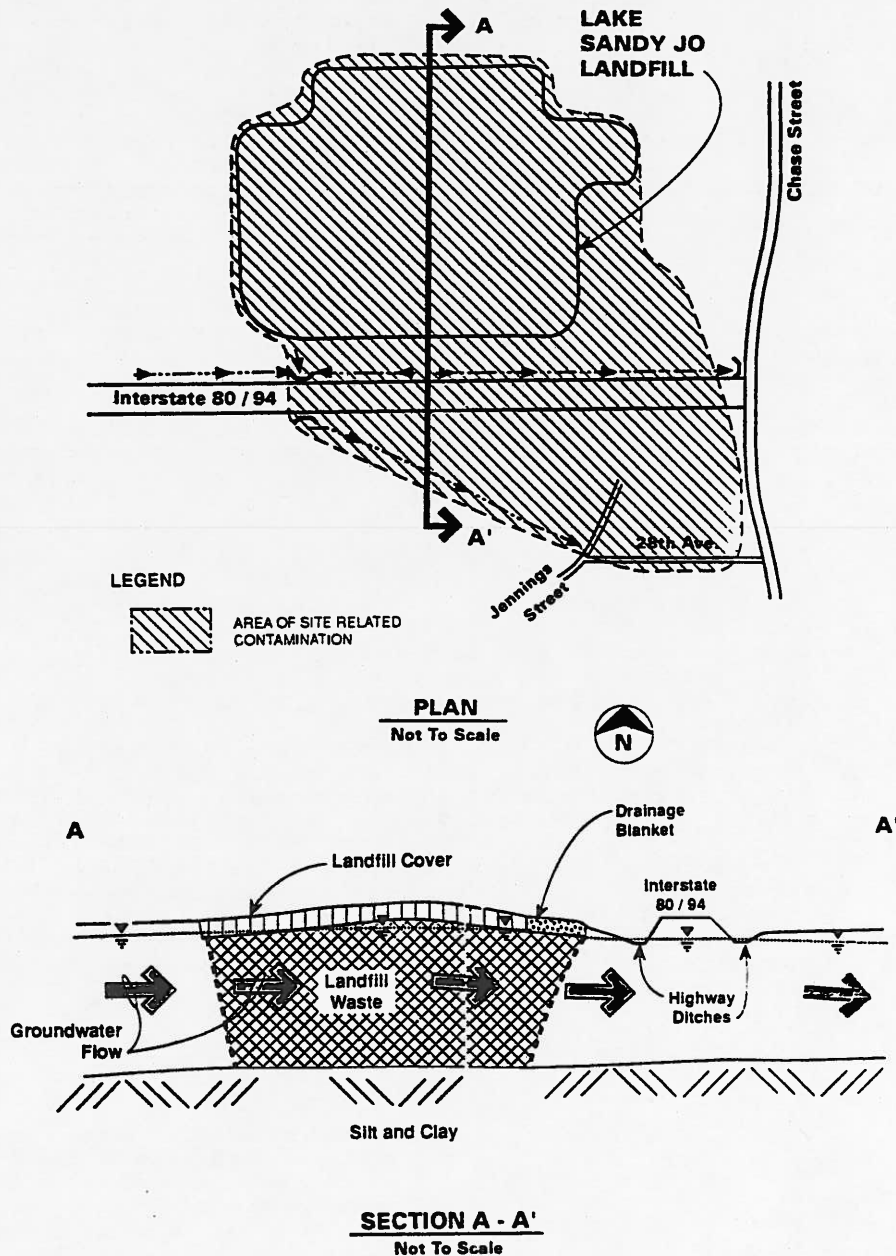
Plan view and illustrative section of remedial action at Lake Sandy Jo site.
